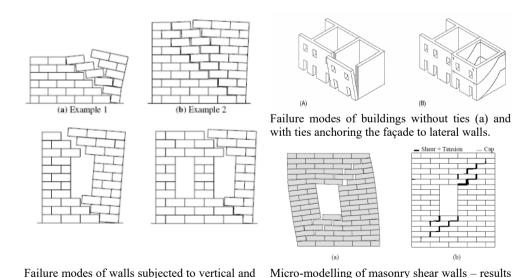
Failure modes in masonry construction. *Source*: [11]
